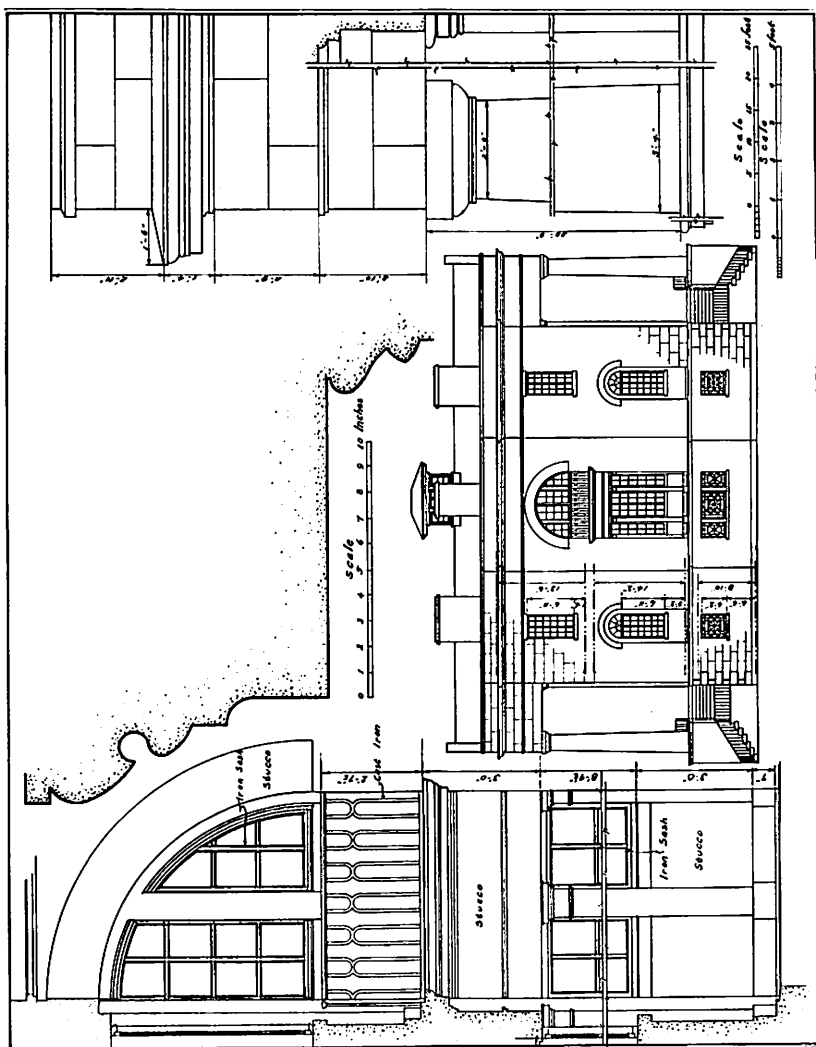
East front and details of the Fireproof Building (by L. K. Montgomery, HABS. 1934).
